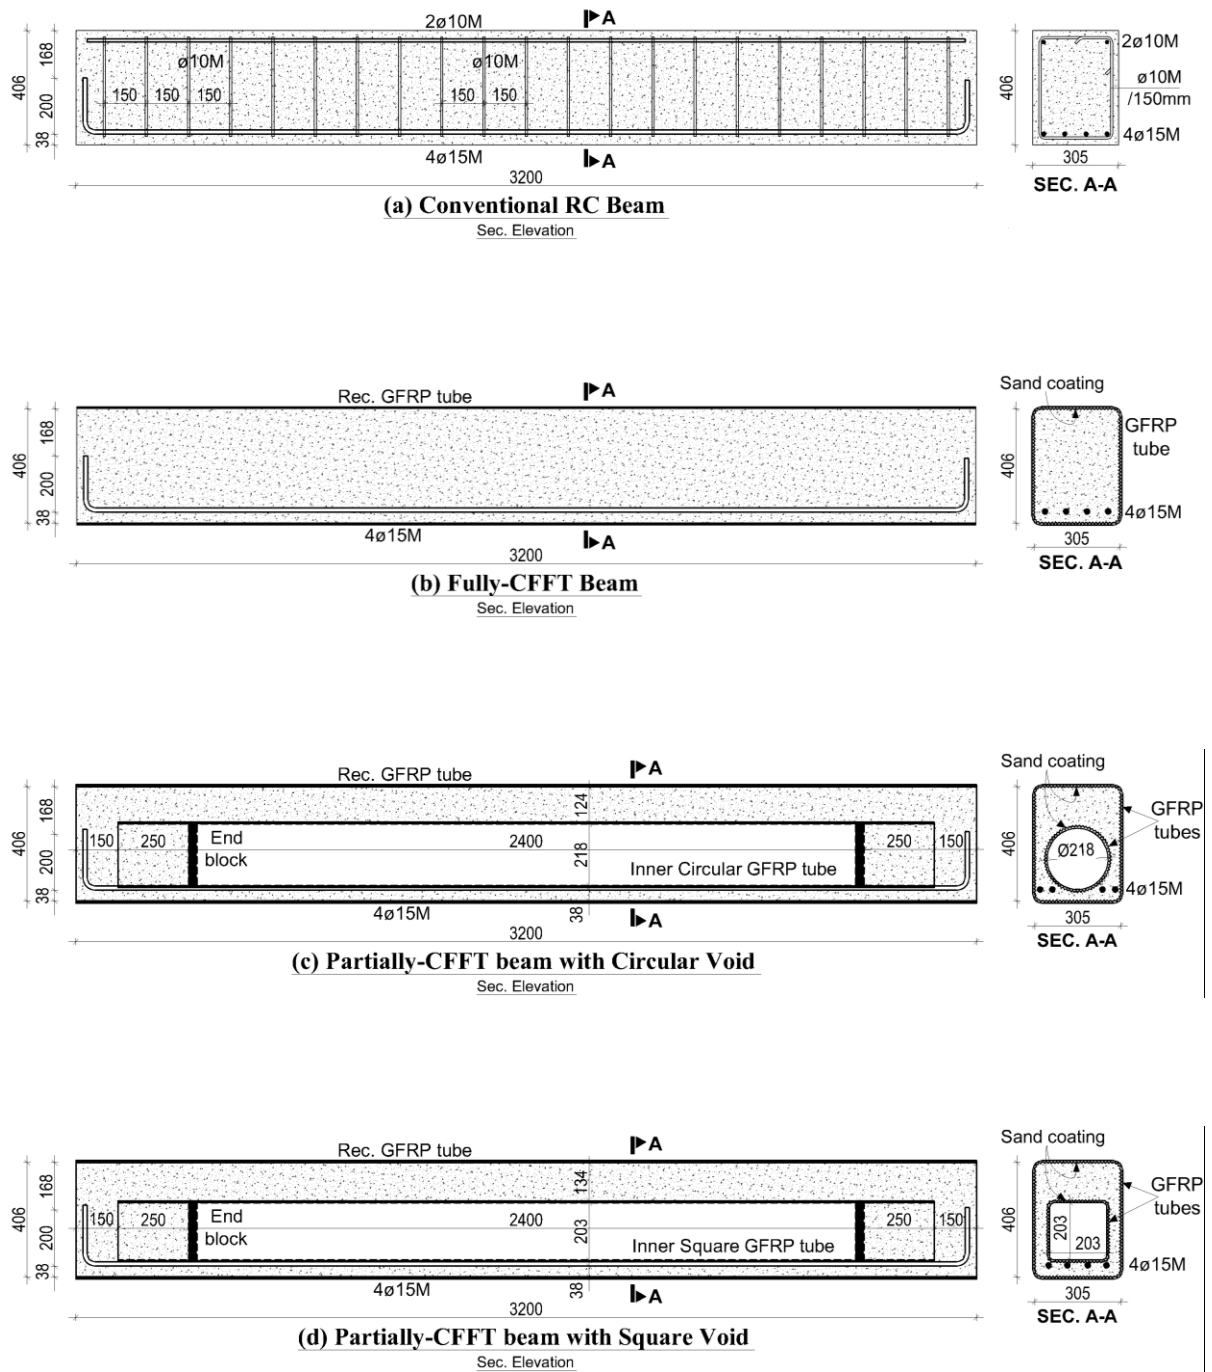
Details of beam specimens (dimensions are in mm)
